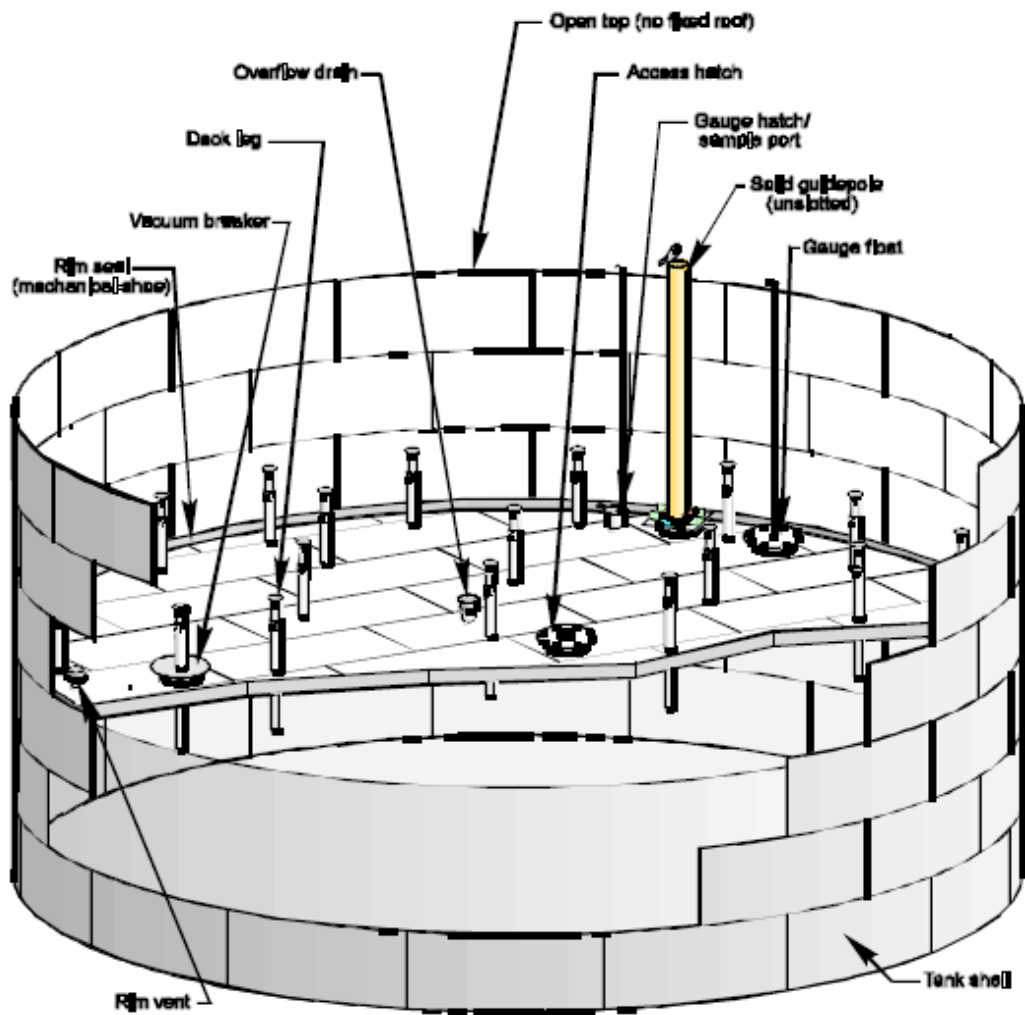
External floating roof tank (double-deck type).<sup>11</sup>
